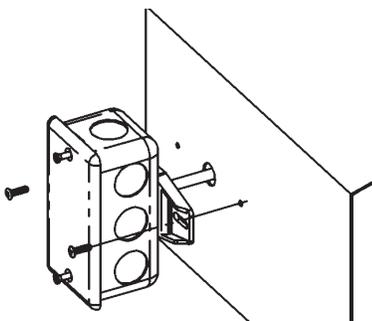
BAPI-Box (BB) Enclosure Mounting and installation Holes (Rotate 90° for Horizontal Mounting)
